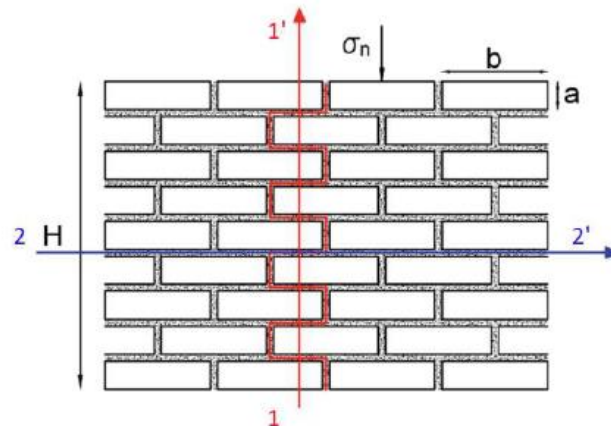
Orientation of Plane 1-1' and Plane 2-2' in the Masonry model (Amorosi, 2018)
